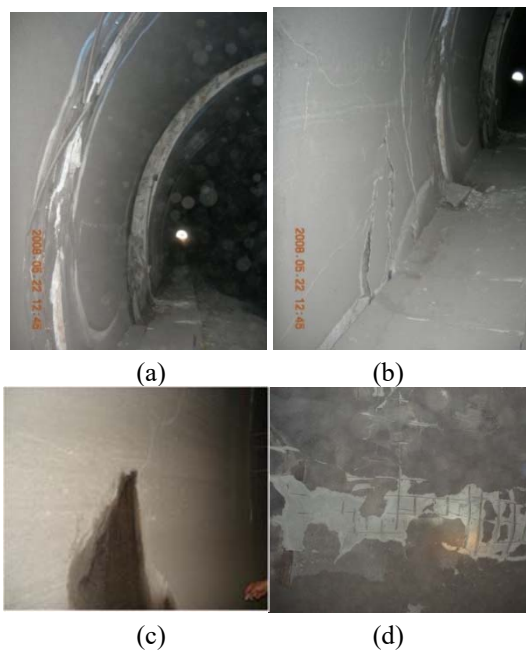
Seismic damages of soft-hard rock junction in Wenchuan Earthquake: (a) Staggered lining in Baiyundung tunnel; (b) Lining cracking in Baiyundung tunnel; (c) Inclined cracking and water seepage of lining in Ma'anishi Tunnel; (d) Lining spalling and block dropping in Youyi Tunnel
